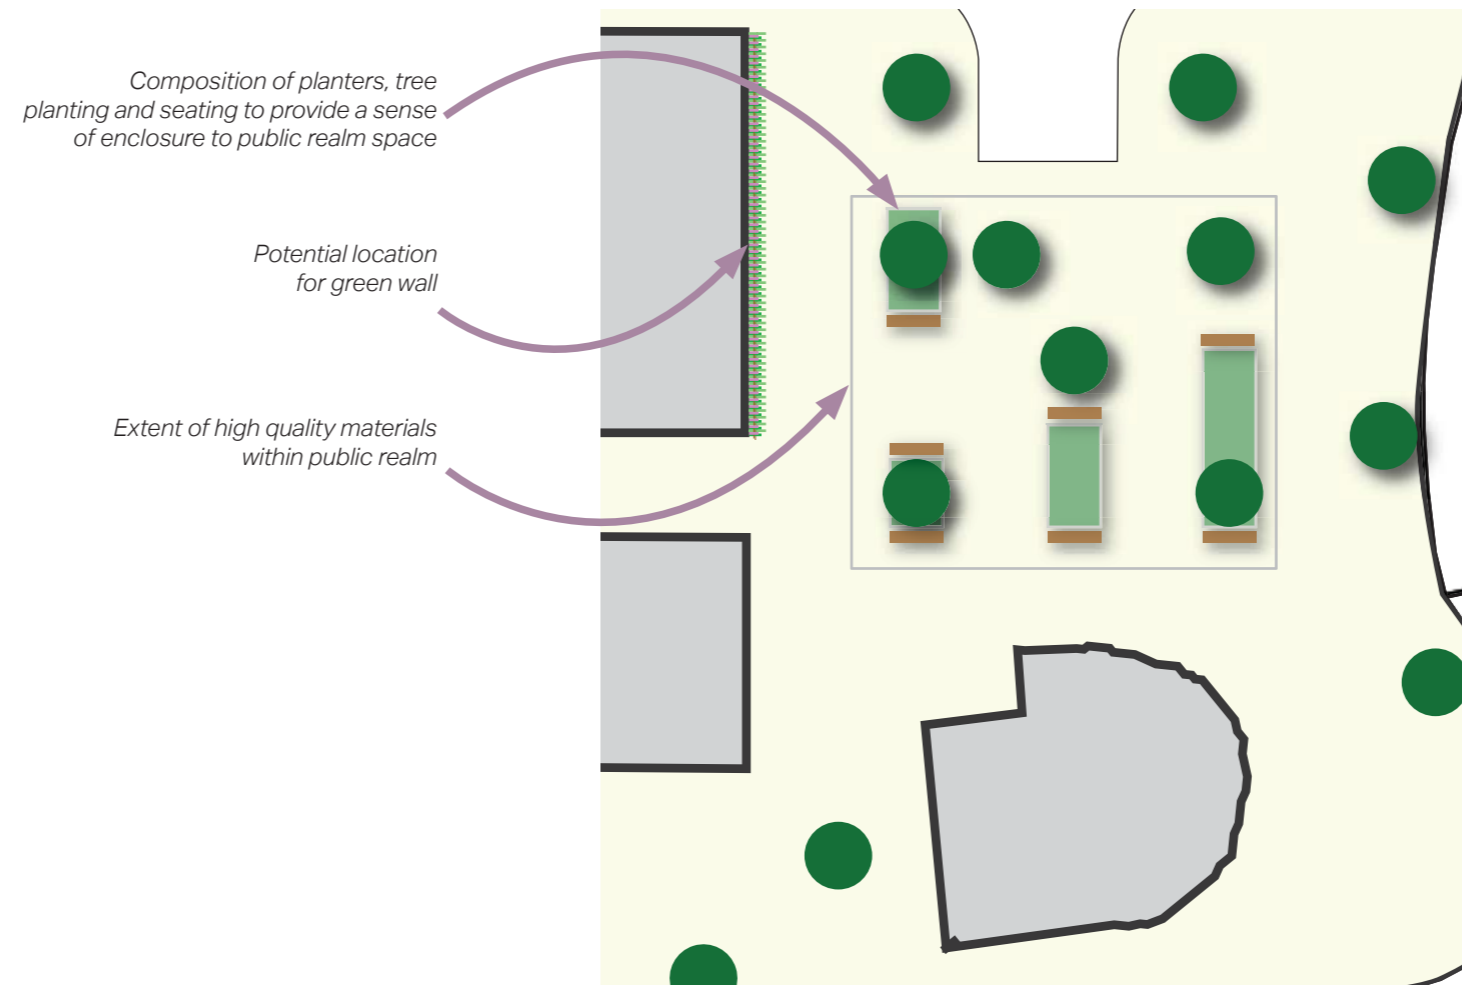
Sketch plan illustrating an arrangement of tree planting, shrub planters and seating, with a potential green wall installed on an adjacent building
